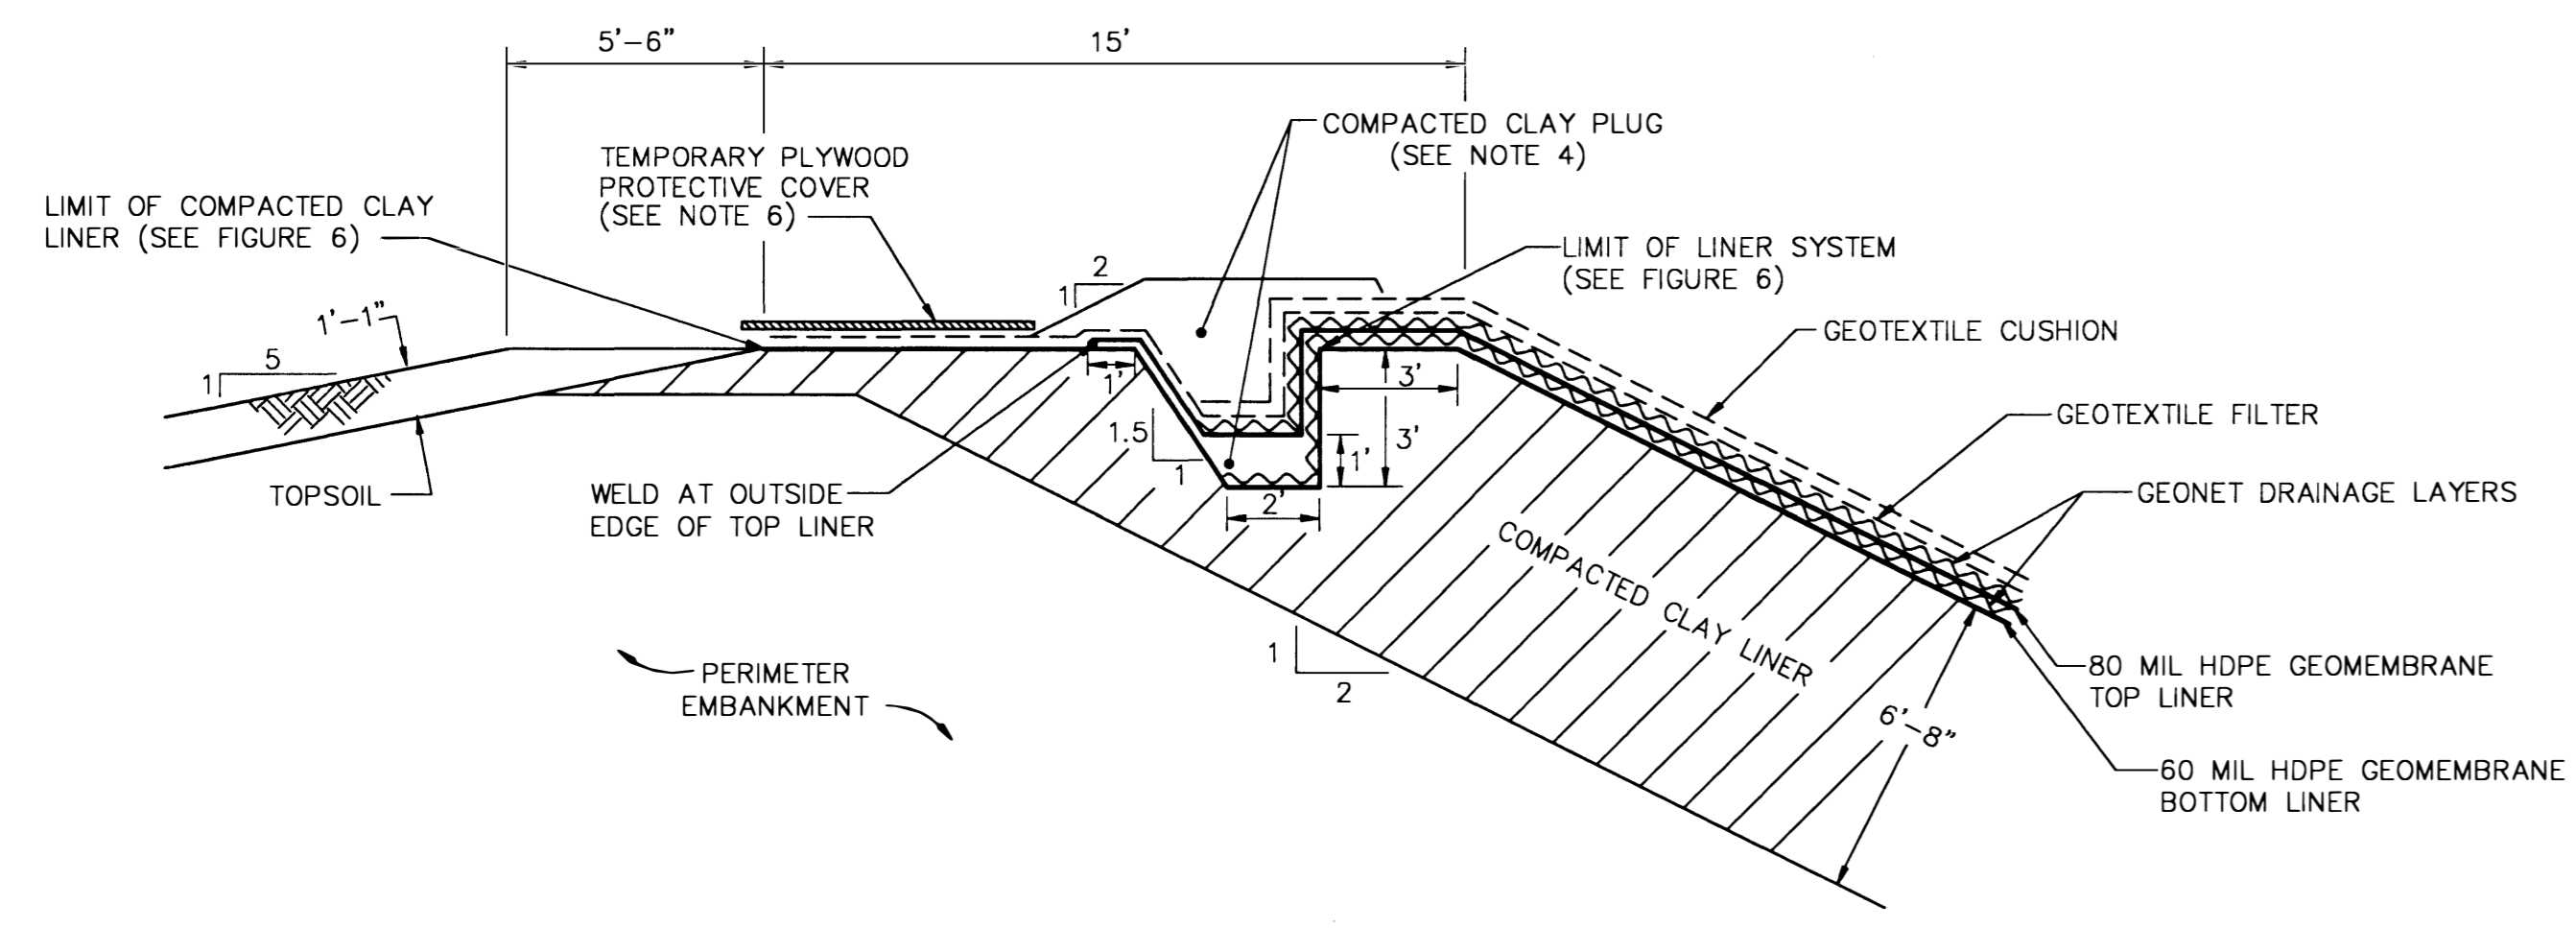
Above Ground Hazardous Waste Landvault No. 2 Cover Design Details
